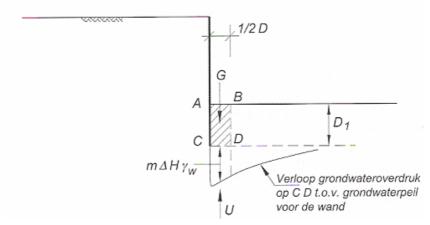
Hydraulic heave calculations with the Terzaghi method
